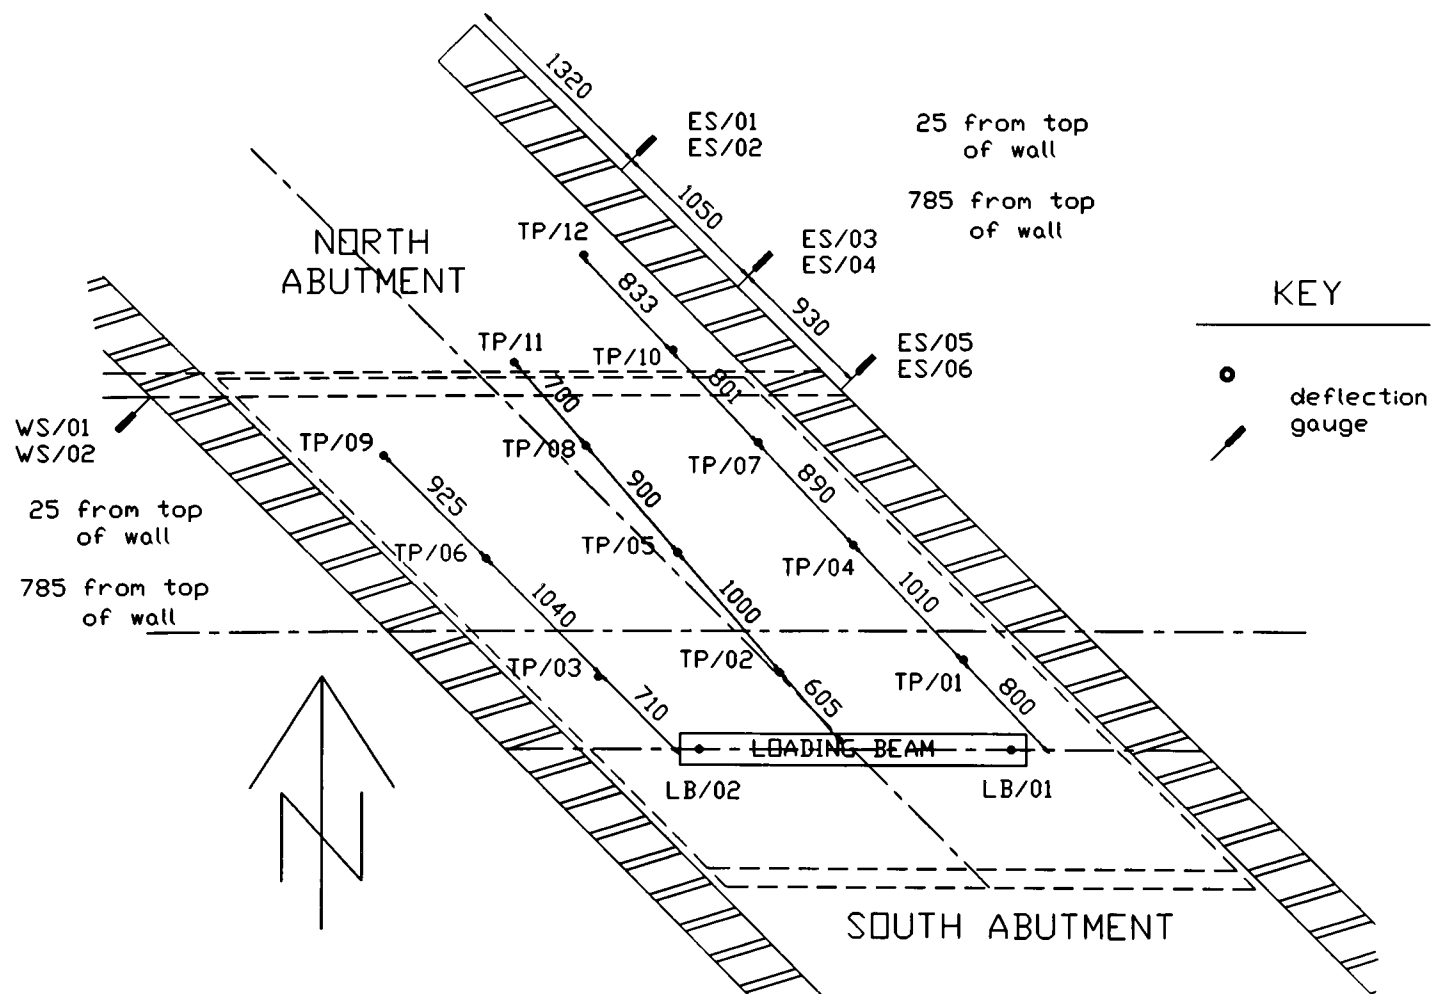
Plan on typical bridge showing surfacing deflection gauges
